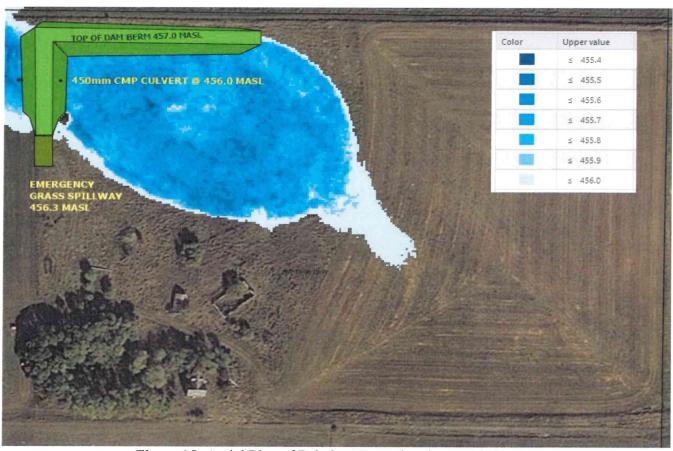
Aerial Plan of Driedger Dam showing ponded water
